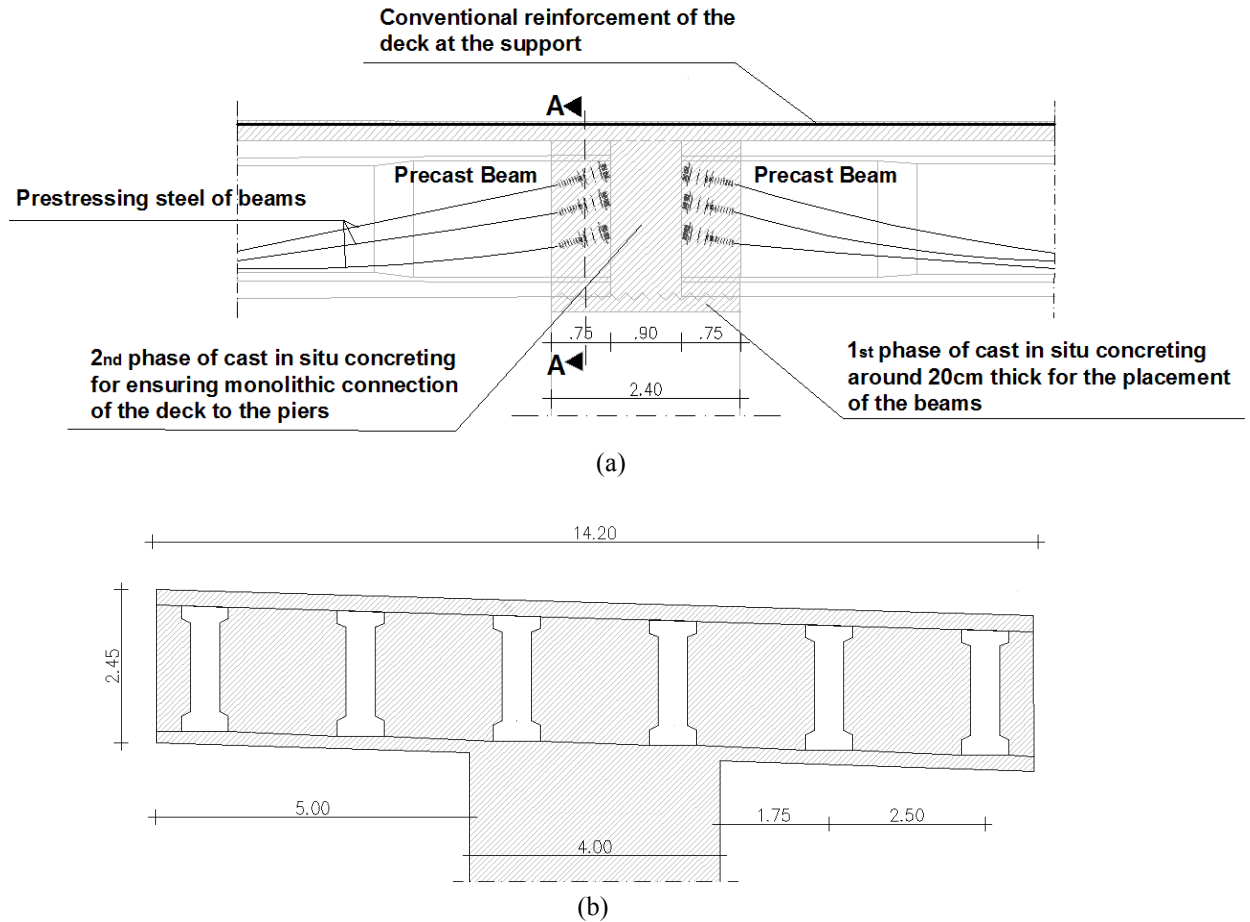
(a) Longitudinal section at the pier. (b) Cross section A-A at the pier.
